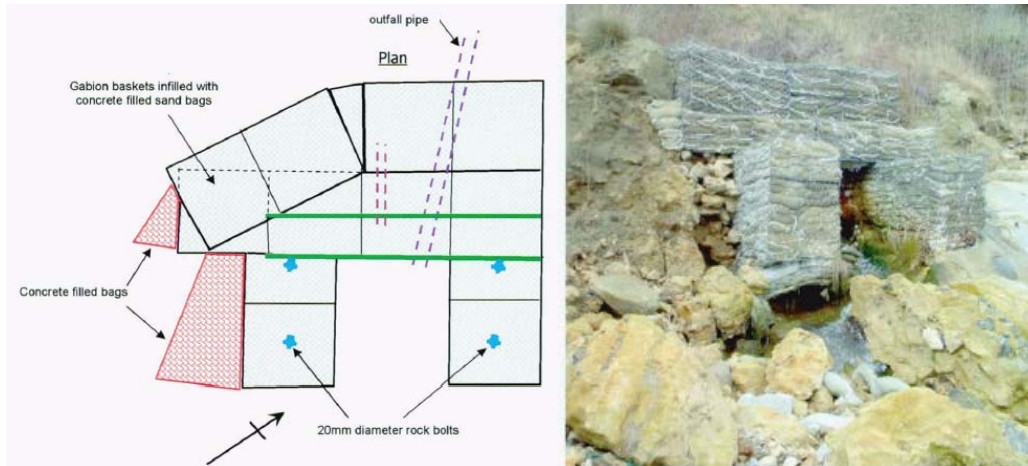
Outfall protection works with destroyed areas in 2004/2005 shown in red and in the adjacent photo.
